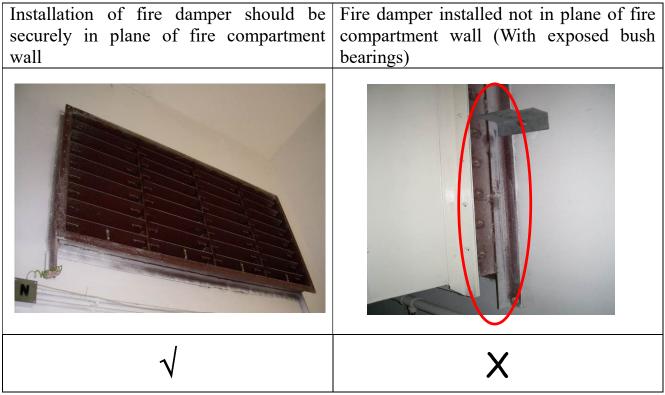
Fire damper (Fixing of damper in fire compartment wall)
